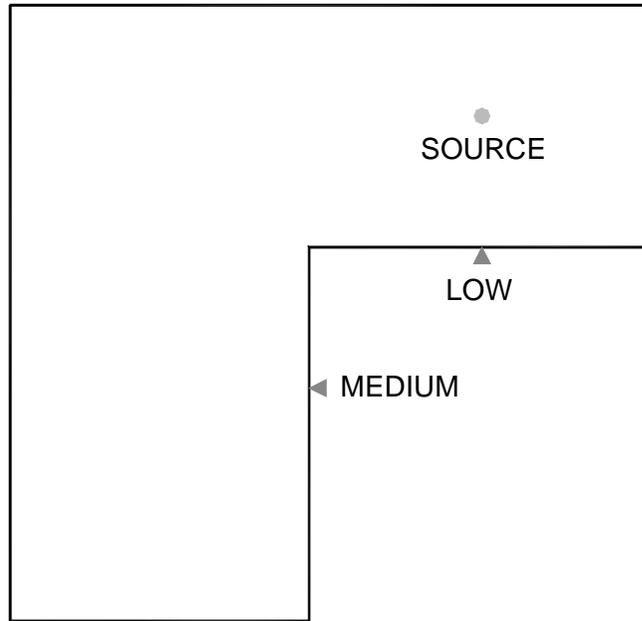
Raised Sidewall Intake Placement - Complex Building Geometry (Plan View)
